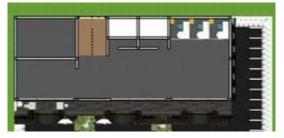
3rd Floor Plan (Source: Processed by the Author, 2023)
